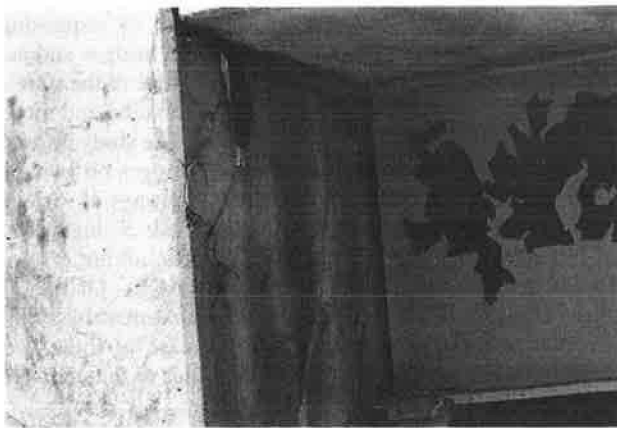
Observed damage to abutment backwall, early stage.
